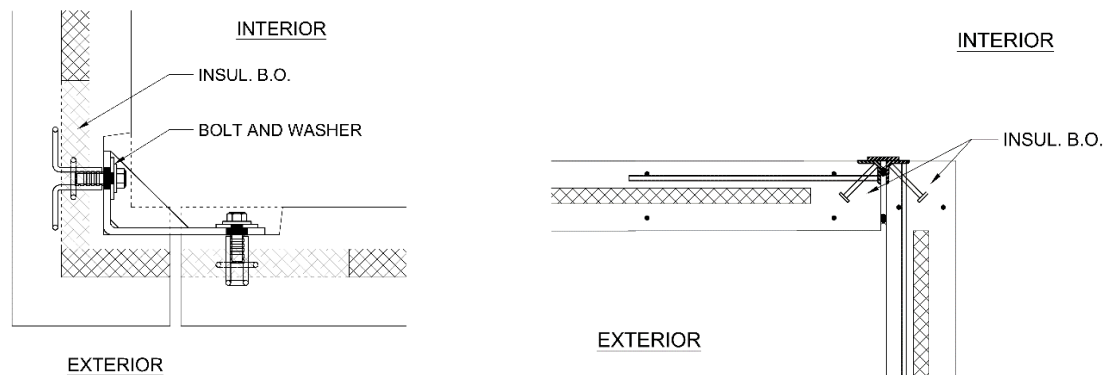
Common butt joint connections with much thermal bridging, plan views
